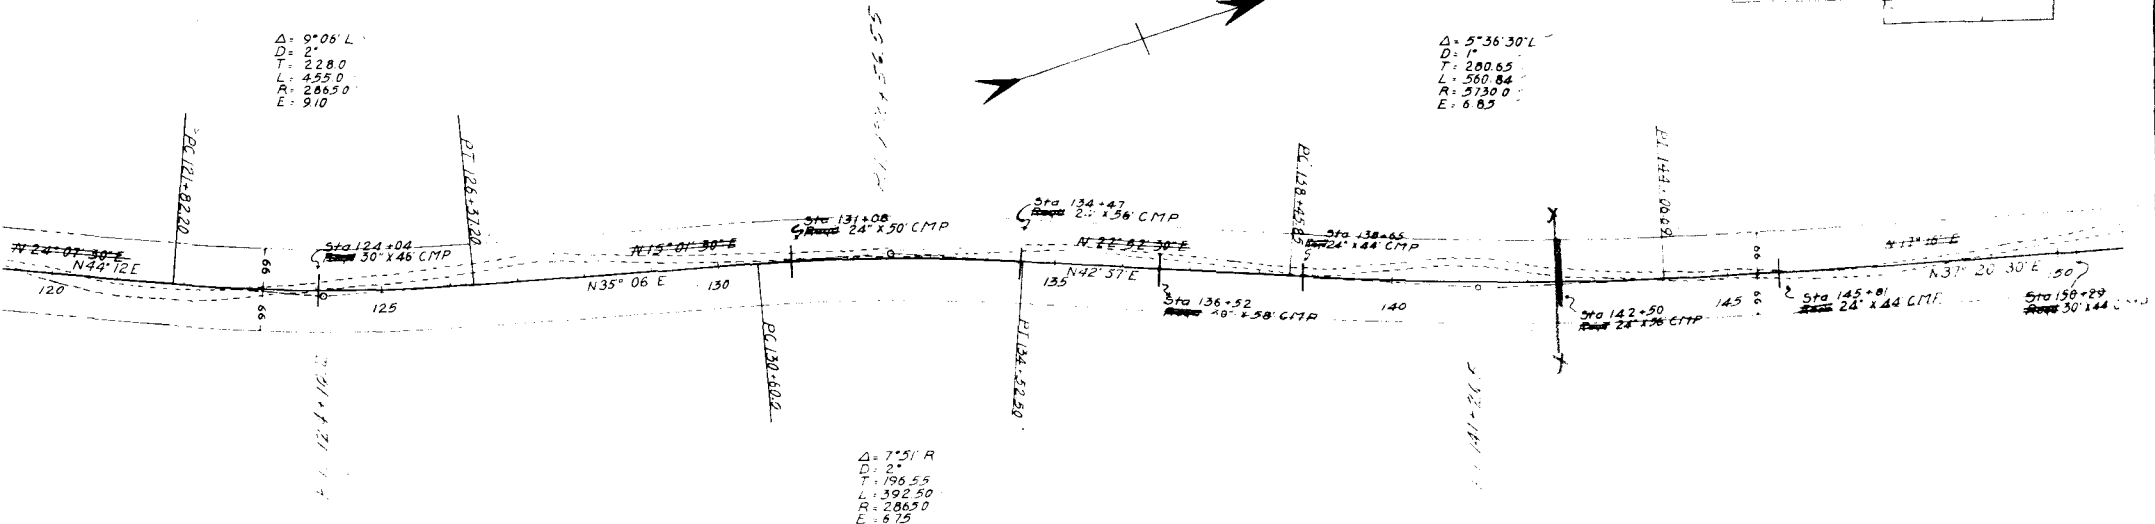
PLAN - PROFILE (1) - - - - - STATION
